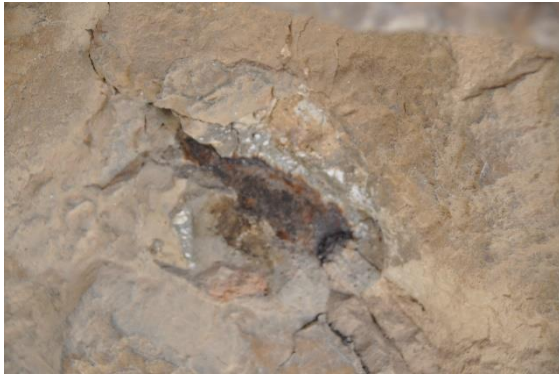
An area where an embedded metallic anchor has corroded and damaged the stone. Such damage was viewed in numerous areas.
